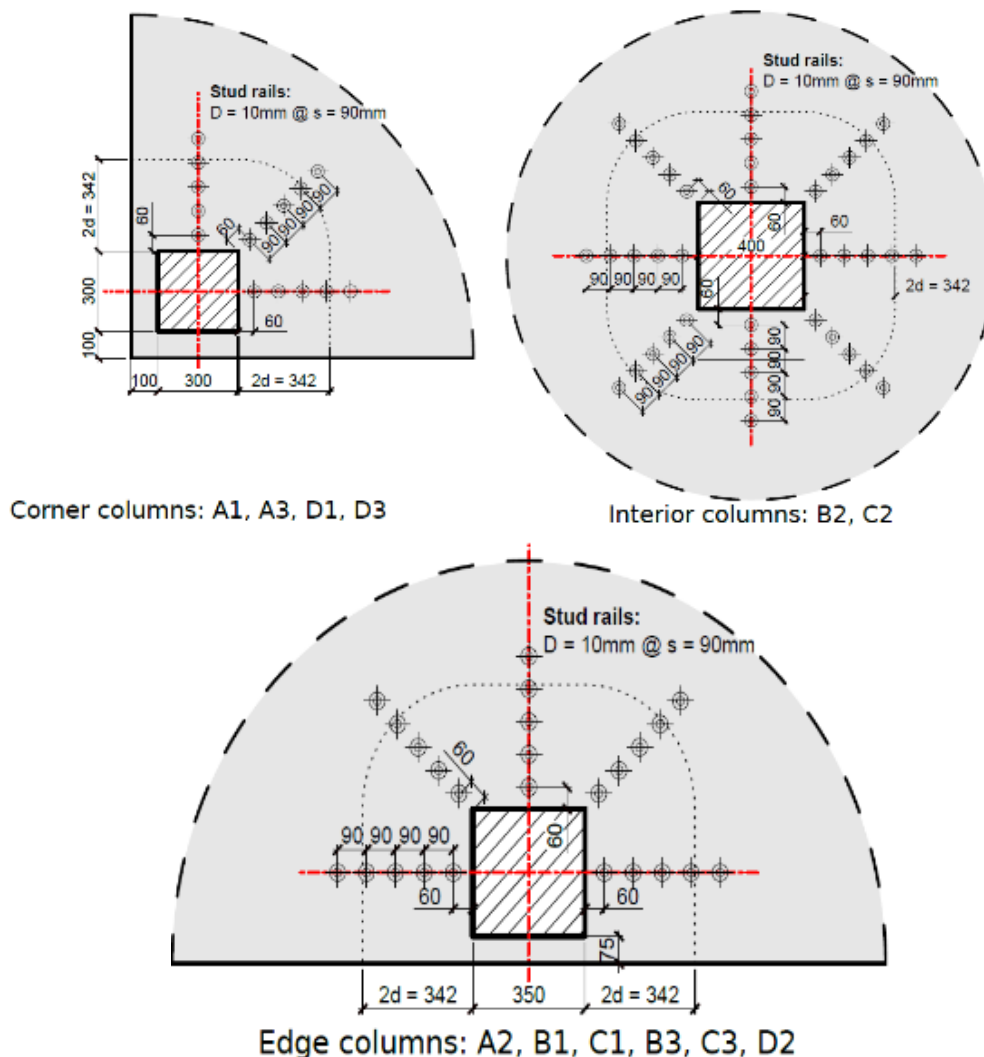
Punching reinforcement at a) corner, b) internal and c) edge slab-column connections at 2nd floor.
